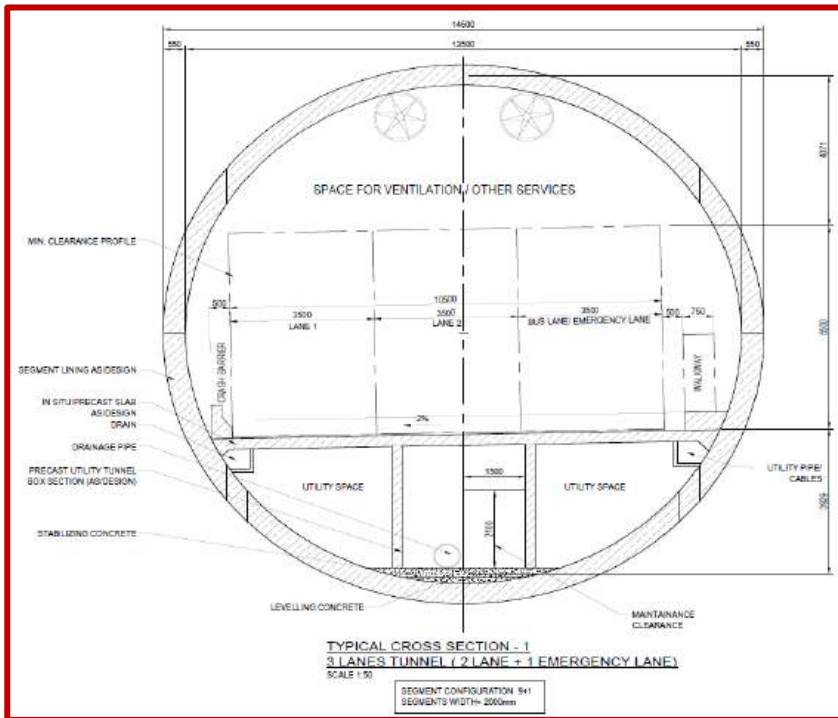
TCS-1, TBM Tunnel Cross-Section
